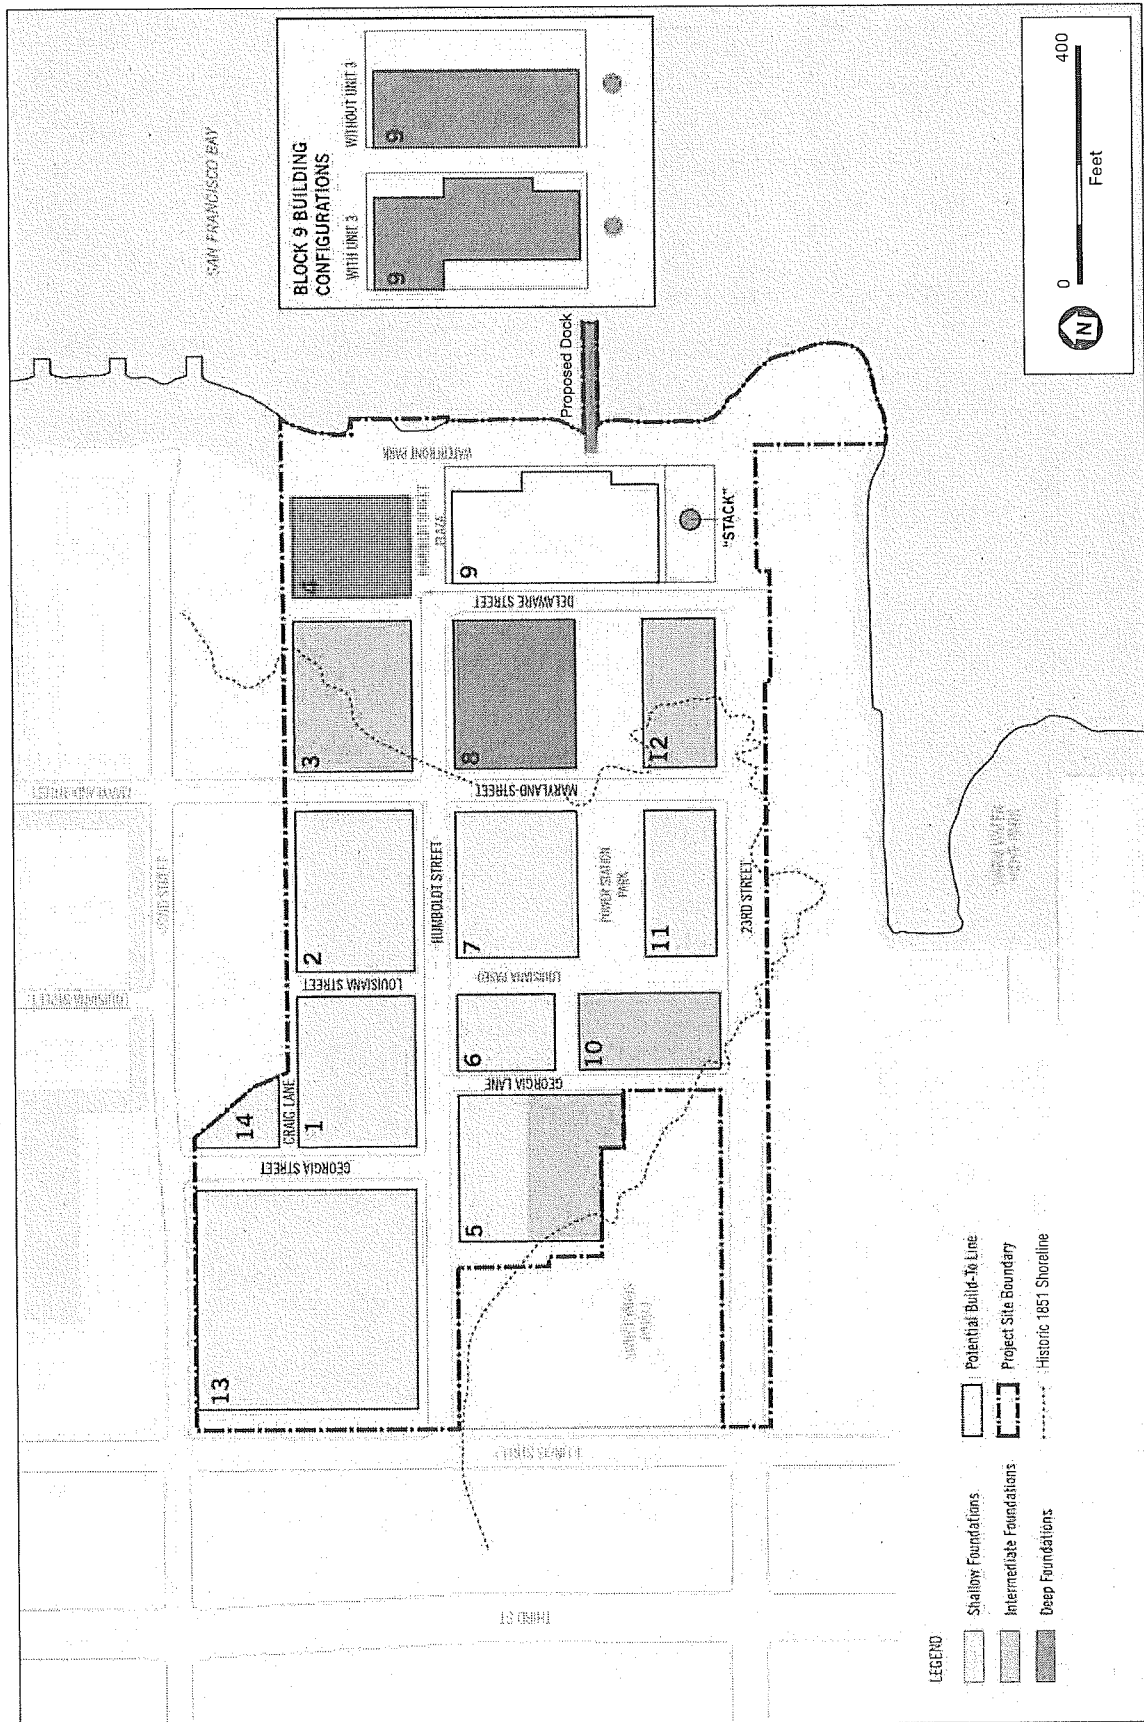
, Proposed Foundation Type Plan, illustrates the proposed foundation type plan for the project site. Construction of the proposed project would require deep foundations using piles for moderately to heavily loaded structures built in areas outside (bayward) of the historic 1851 shoreline, whereas shallow foundations made with spread footings with slab-on-grade or a structural mat foundation may be used inland of the historic 1851 shoreline. Structures in the vicinity of the historic 1851 shoreline may be founded on intermediate foundations (shallow foundations with ground improvement on the fill side), or a dual foundation system (shallow foundations on the bedrock side, and piles on the fill side). Deep foundations are anticipated during Phases 1 and 3. Phases 1, 3, and 4 may involve intermediate foundations. Shallow foundations are anticipated for Phases 2, 3, 4, 5 and 6.
